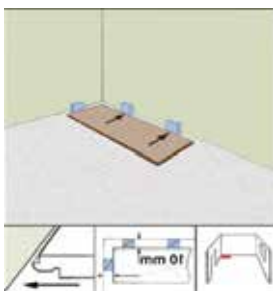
Starting from left to right place the first board in position, with spacers 10mm from wall.
